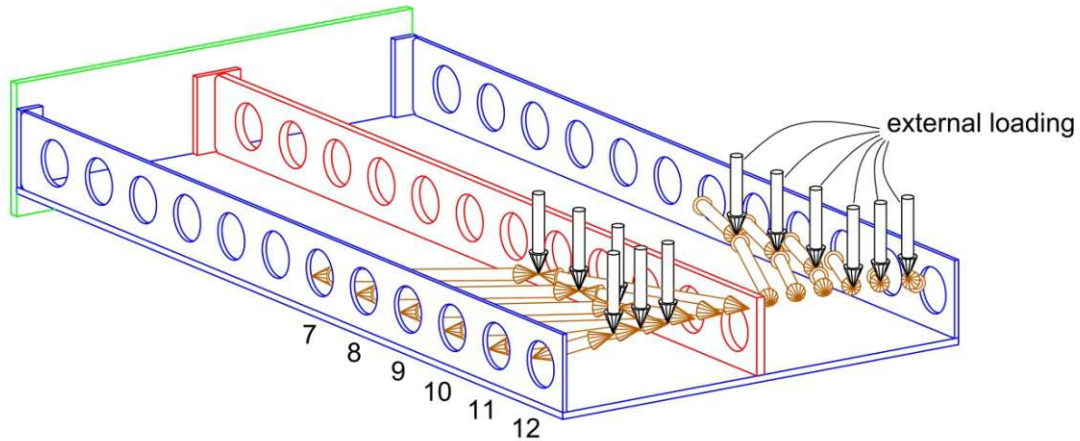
The brown concrete struts represent the force transfer from the external loading to the outside shear connector through the concrete
